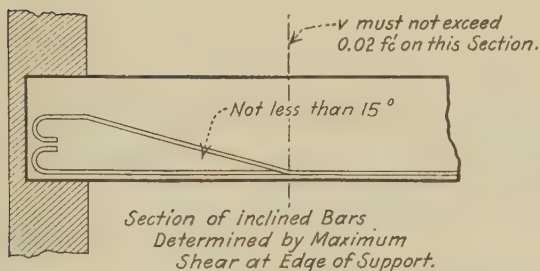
Typical Beam with Web Reinforced by Means of Bars Bent up in Single Plane.
